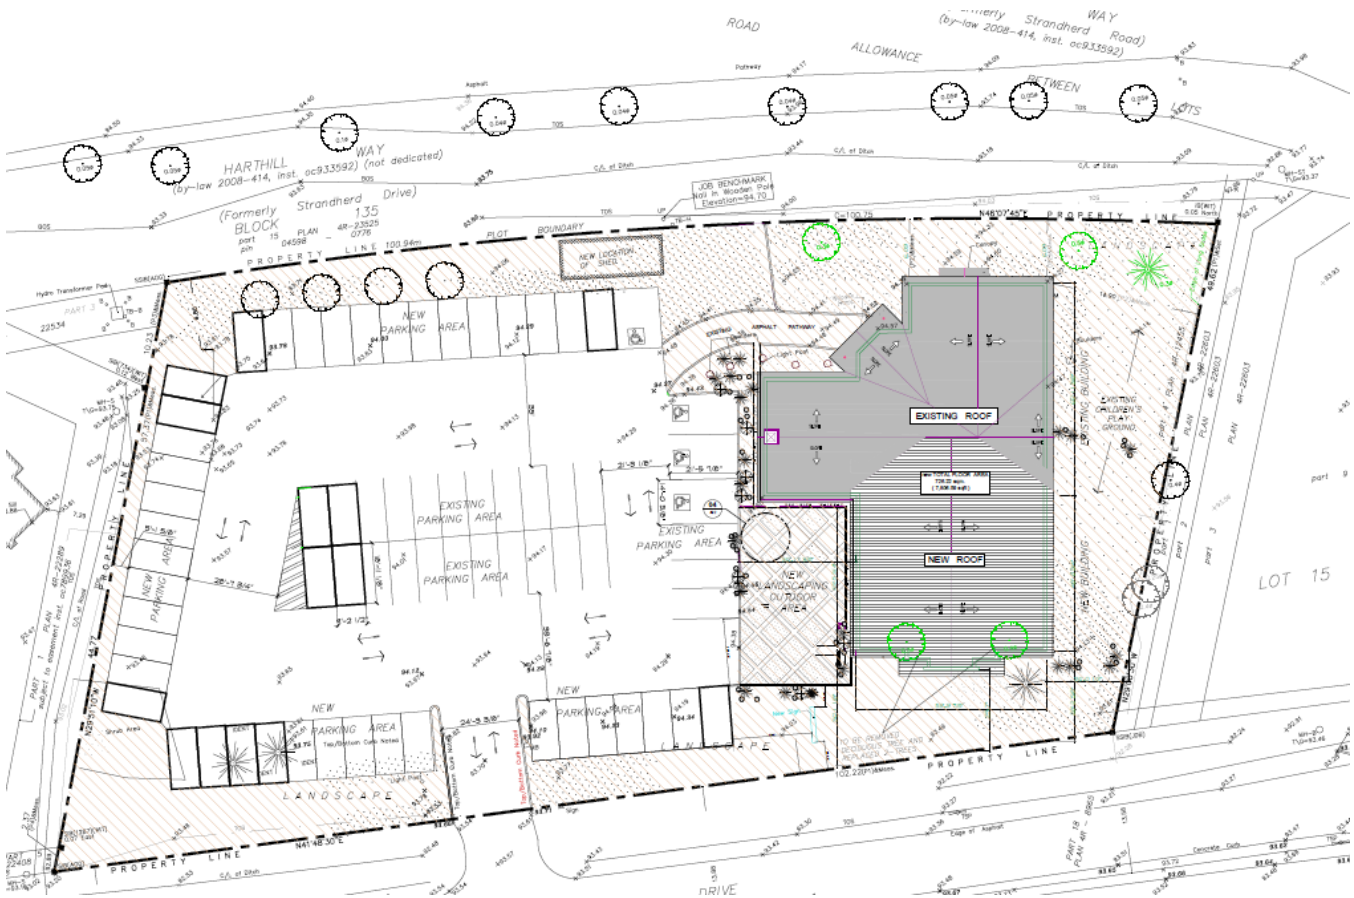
Site Plan displaying the proposed building addition, parking lot expansion, and new outdoor landscaped area.
